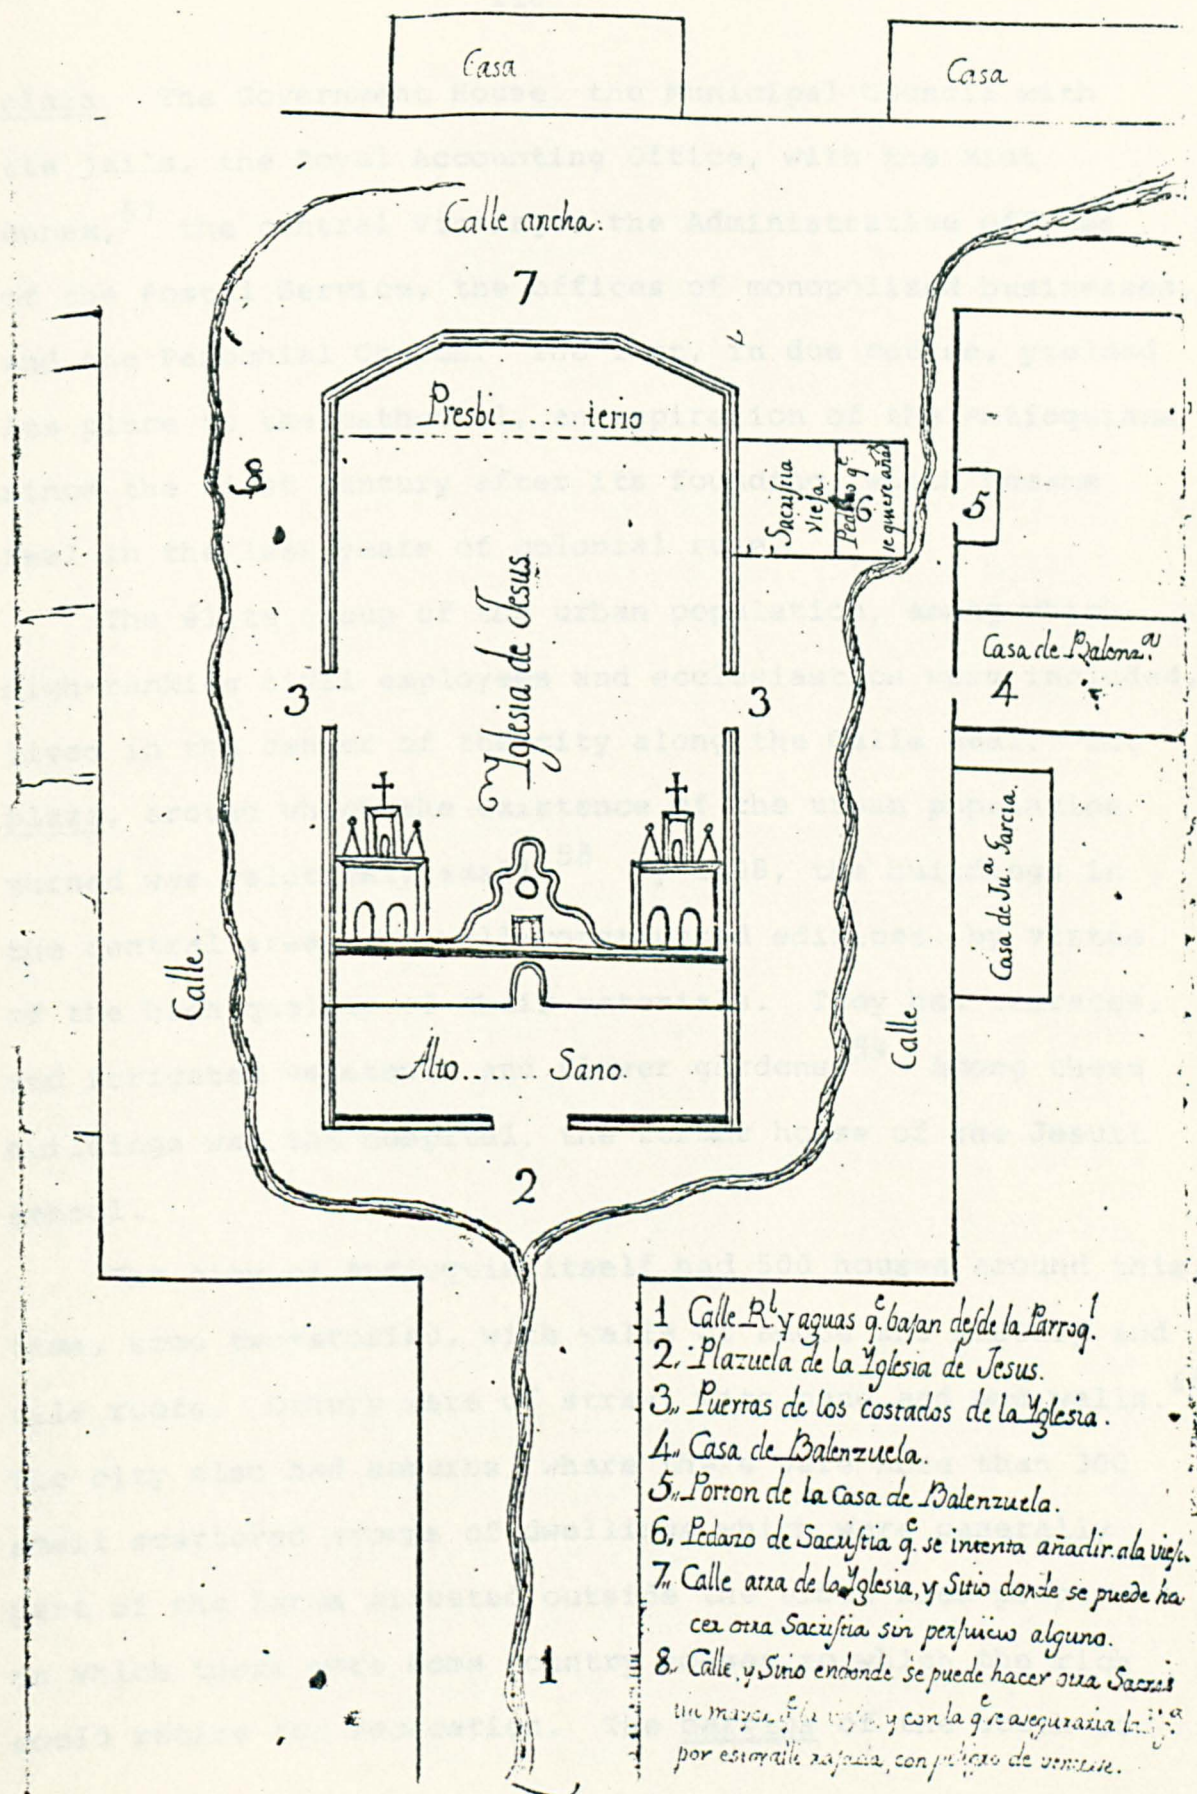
Plan of Jesus de Nazareno Church and adjacent properties, 1795
